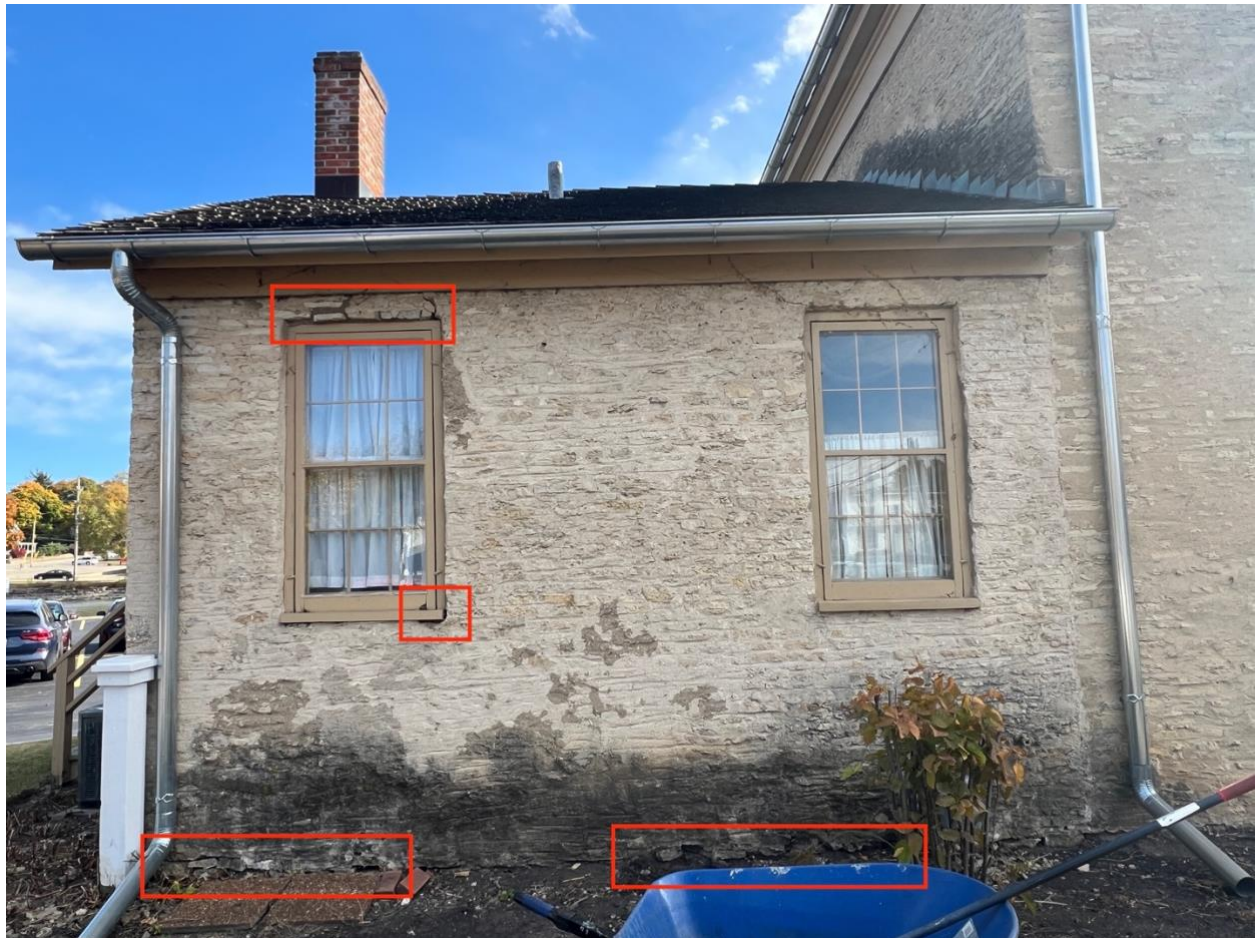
West elevation of the addition highlighting foundation and mortar issues.
